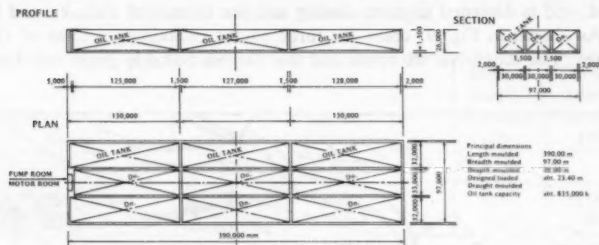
Plan and Section of Typical Oil Storage Barge (one of seven)
